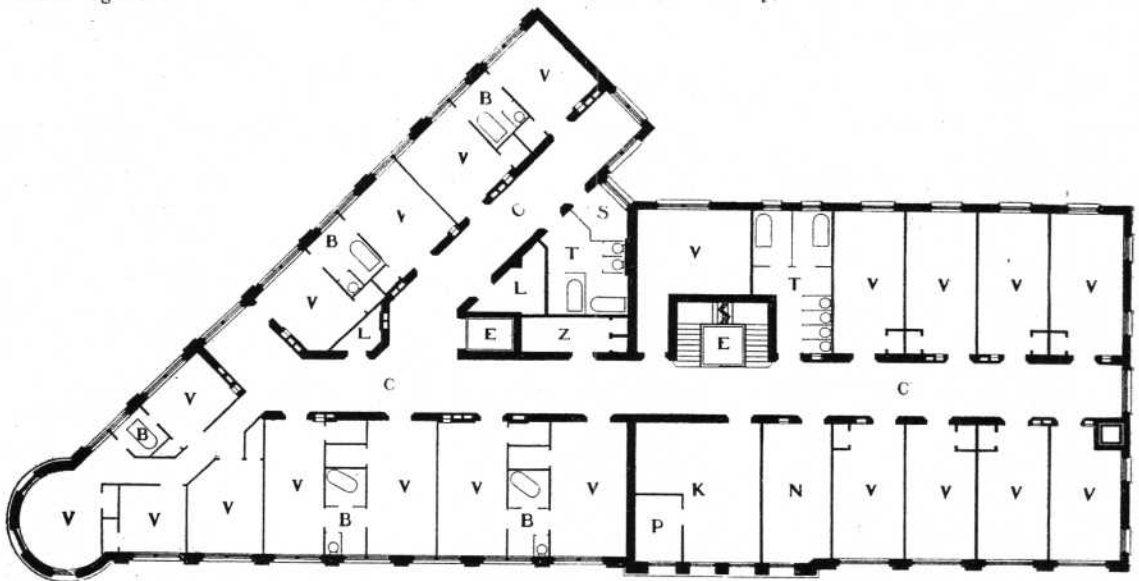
Augustana Hospital. Plan of fourth and fifth floors.
